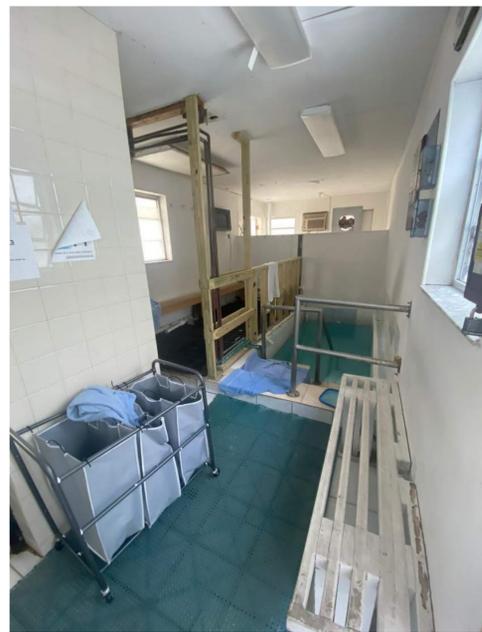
= BACK STRUCTURE RITUAL BATH
